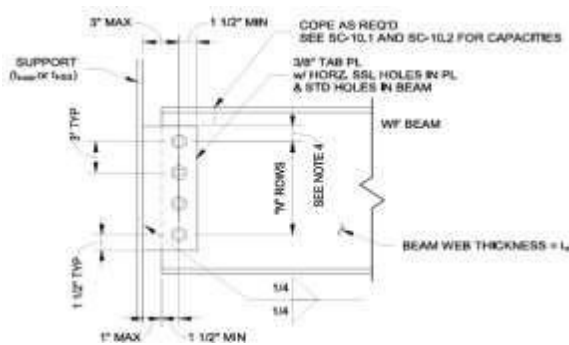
WF Beam to WF Girder SC-2.1A-Shear Tab
